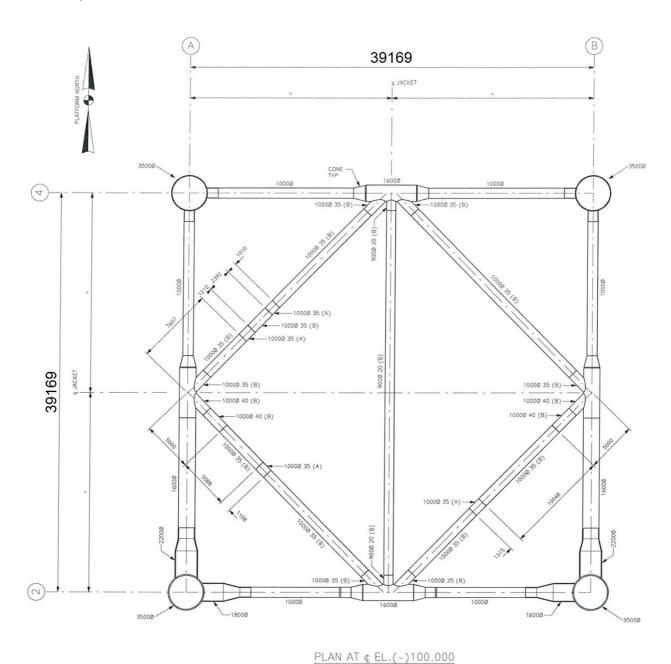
Solan jacket bracing plan at EL. -100.000
